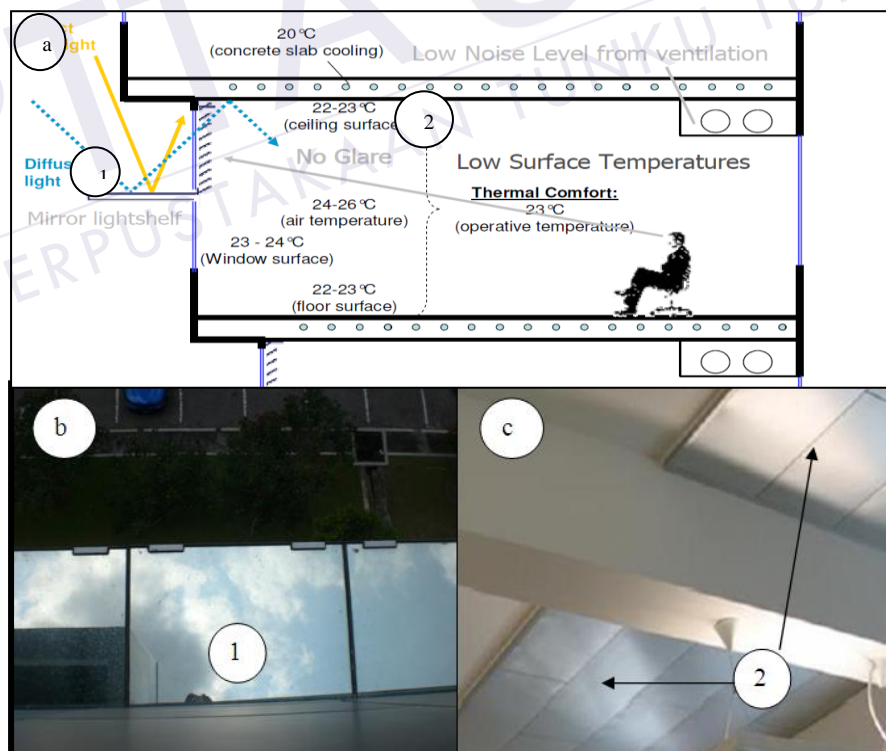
(a) Diffused light entering the building (b) Mirror lightshelf (c) High reflective ceiling
